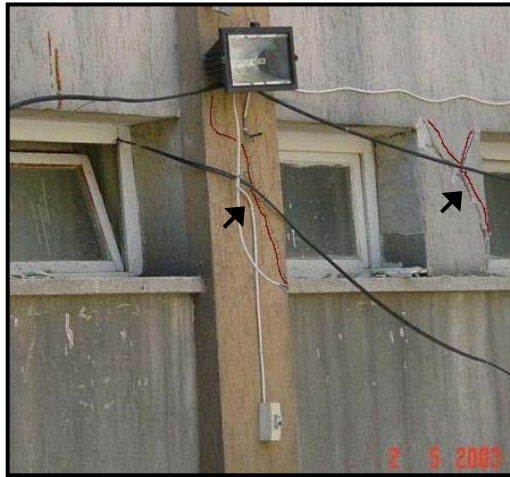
Damage to the ground story captive column-C3 and infill wall between the windows (Bingöl)
